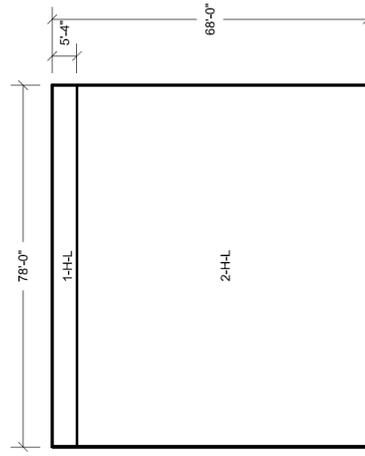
H.6-73: PUMP HOUSE INTERNAL EAST WALL LOOKING WEST
